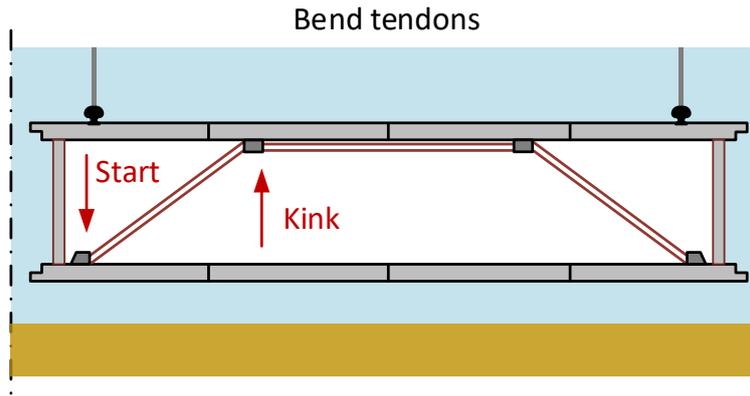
, PRESTRESSING VARIANT 3 LAYOUT; LONGITUDINAL VIEW
